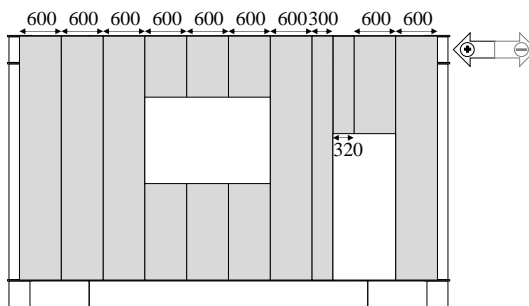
Configuration of light gauge steel (LGS) wall
